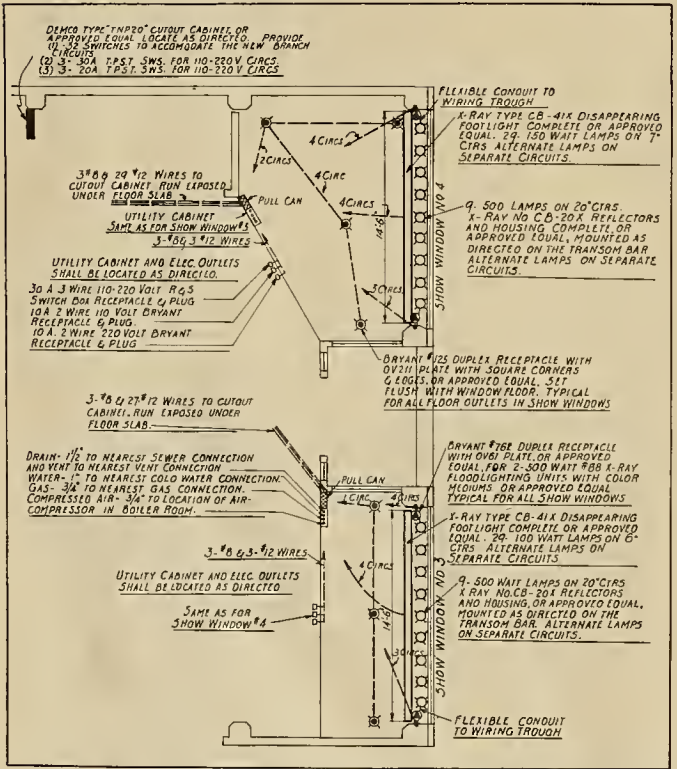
Floor plan showing window lighting layout specified for the Pacific Gas and Electric Company.
